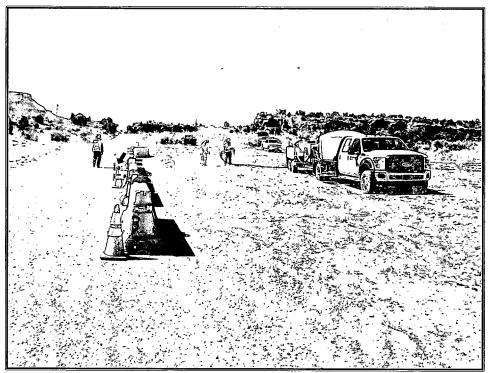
Potholing and setting of barricades along County Road 7007 prior to excavation of the Lateral C-7 Pipeline.
